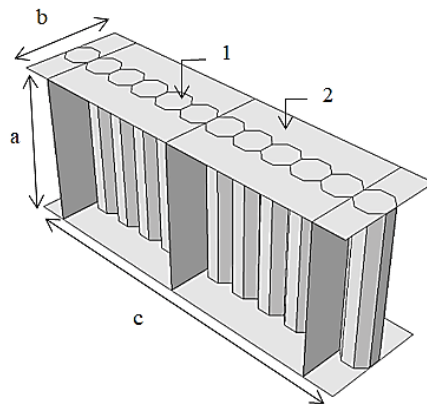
Finite element model of steel plate honeycomb steel web girder: a – web depth; b – flange width; c – girder length; 1 – honeycomb steel web; 2 – steel web
